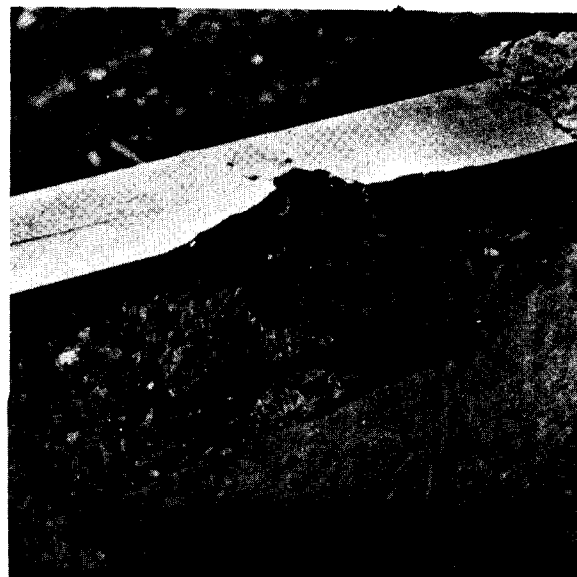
Structural cracking and spalling of precast parapets in vicinity of mortar-filled void.
